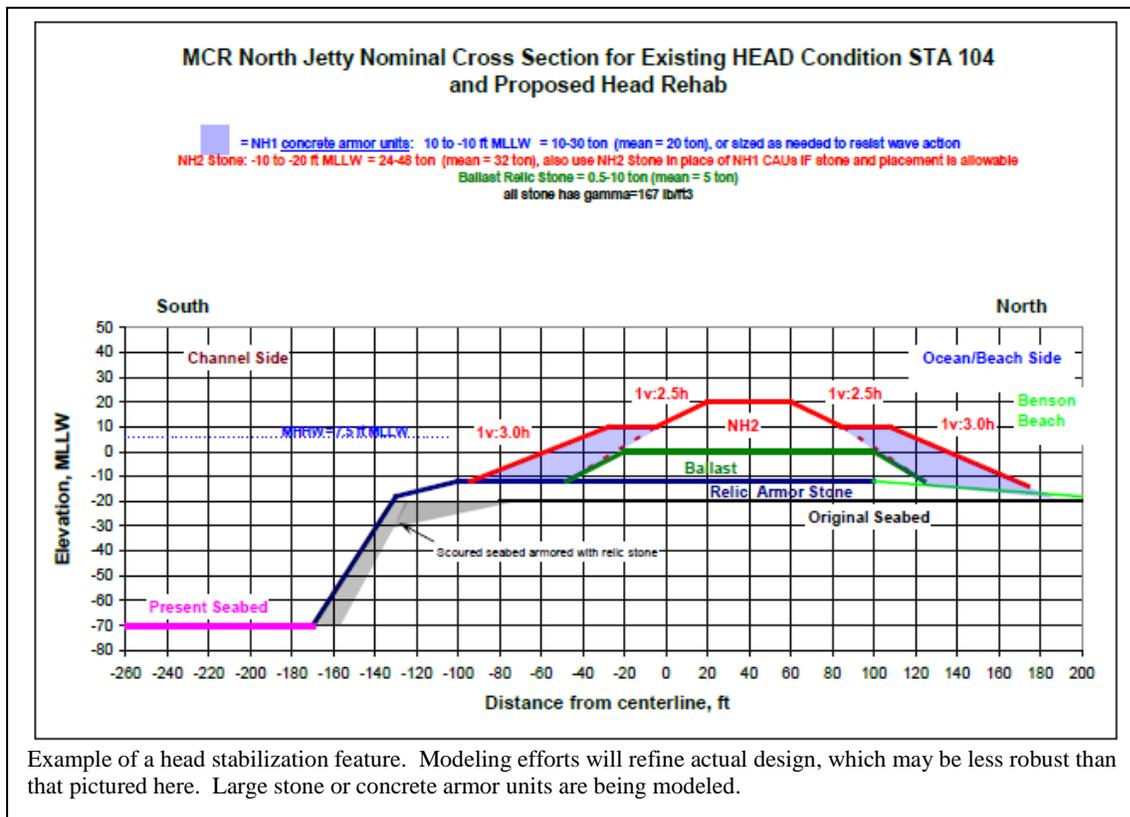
North Jetty Example Cross Section of Head Stabilization Feature
